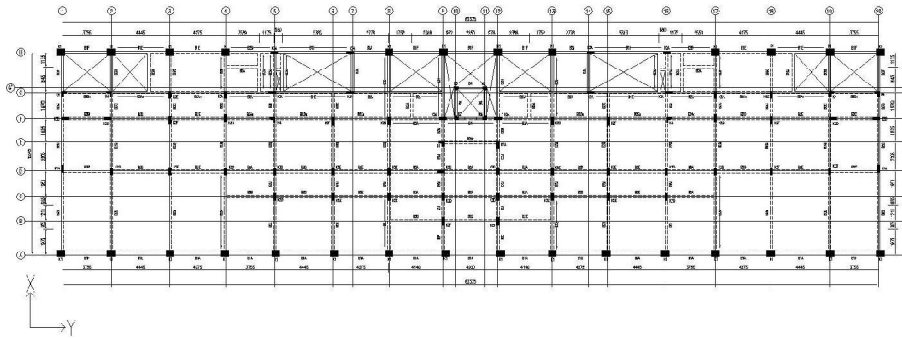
Typical Floor Plan (1st floor – 3rd floor)
